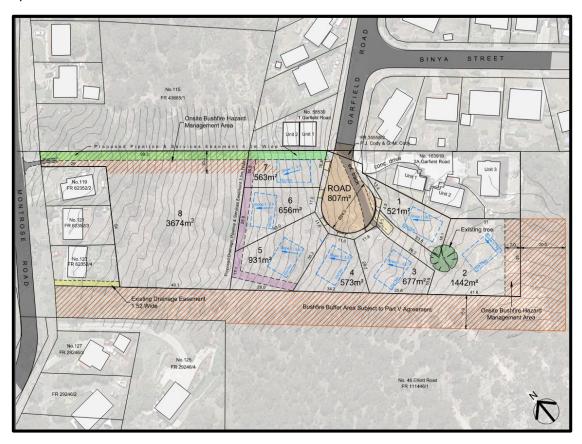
The plan of subdivision of Garfield Place (CT 36090/1) into eight lots.
